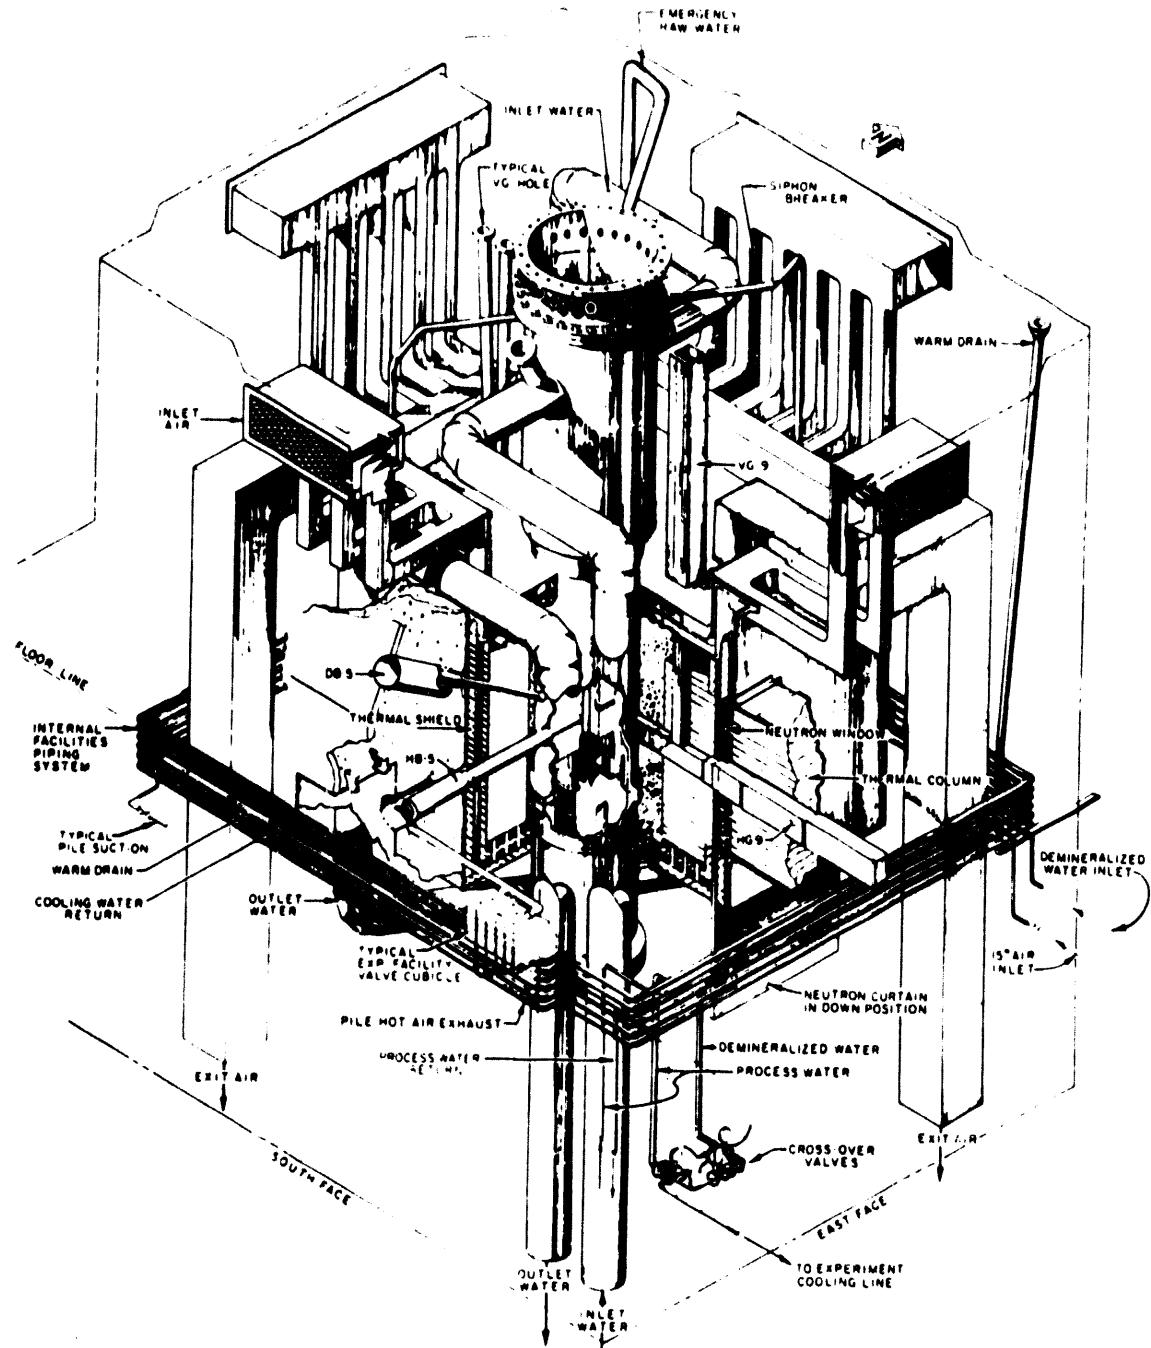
Cutaway isometric of reactor structure showing typical arrangement of penetrations, piping, experiment facilities, and air ducts.
